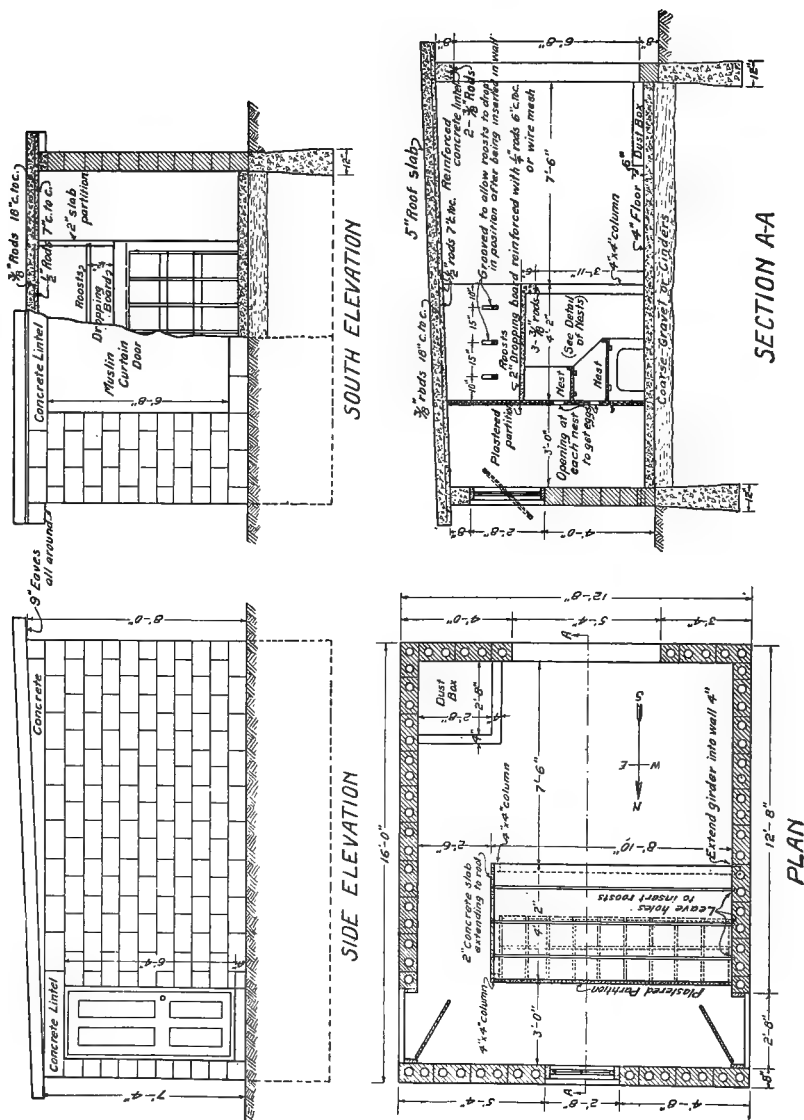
Concrete Block Poultry House which may be enlarged to accommodate additional flocks by duplicating the structure as shown.
